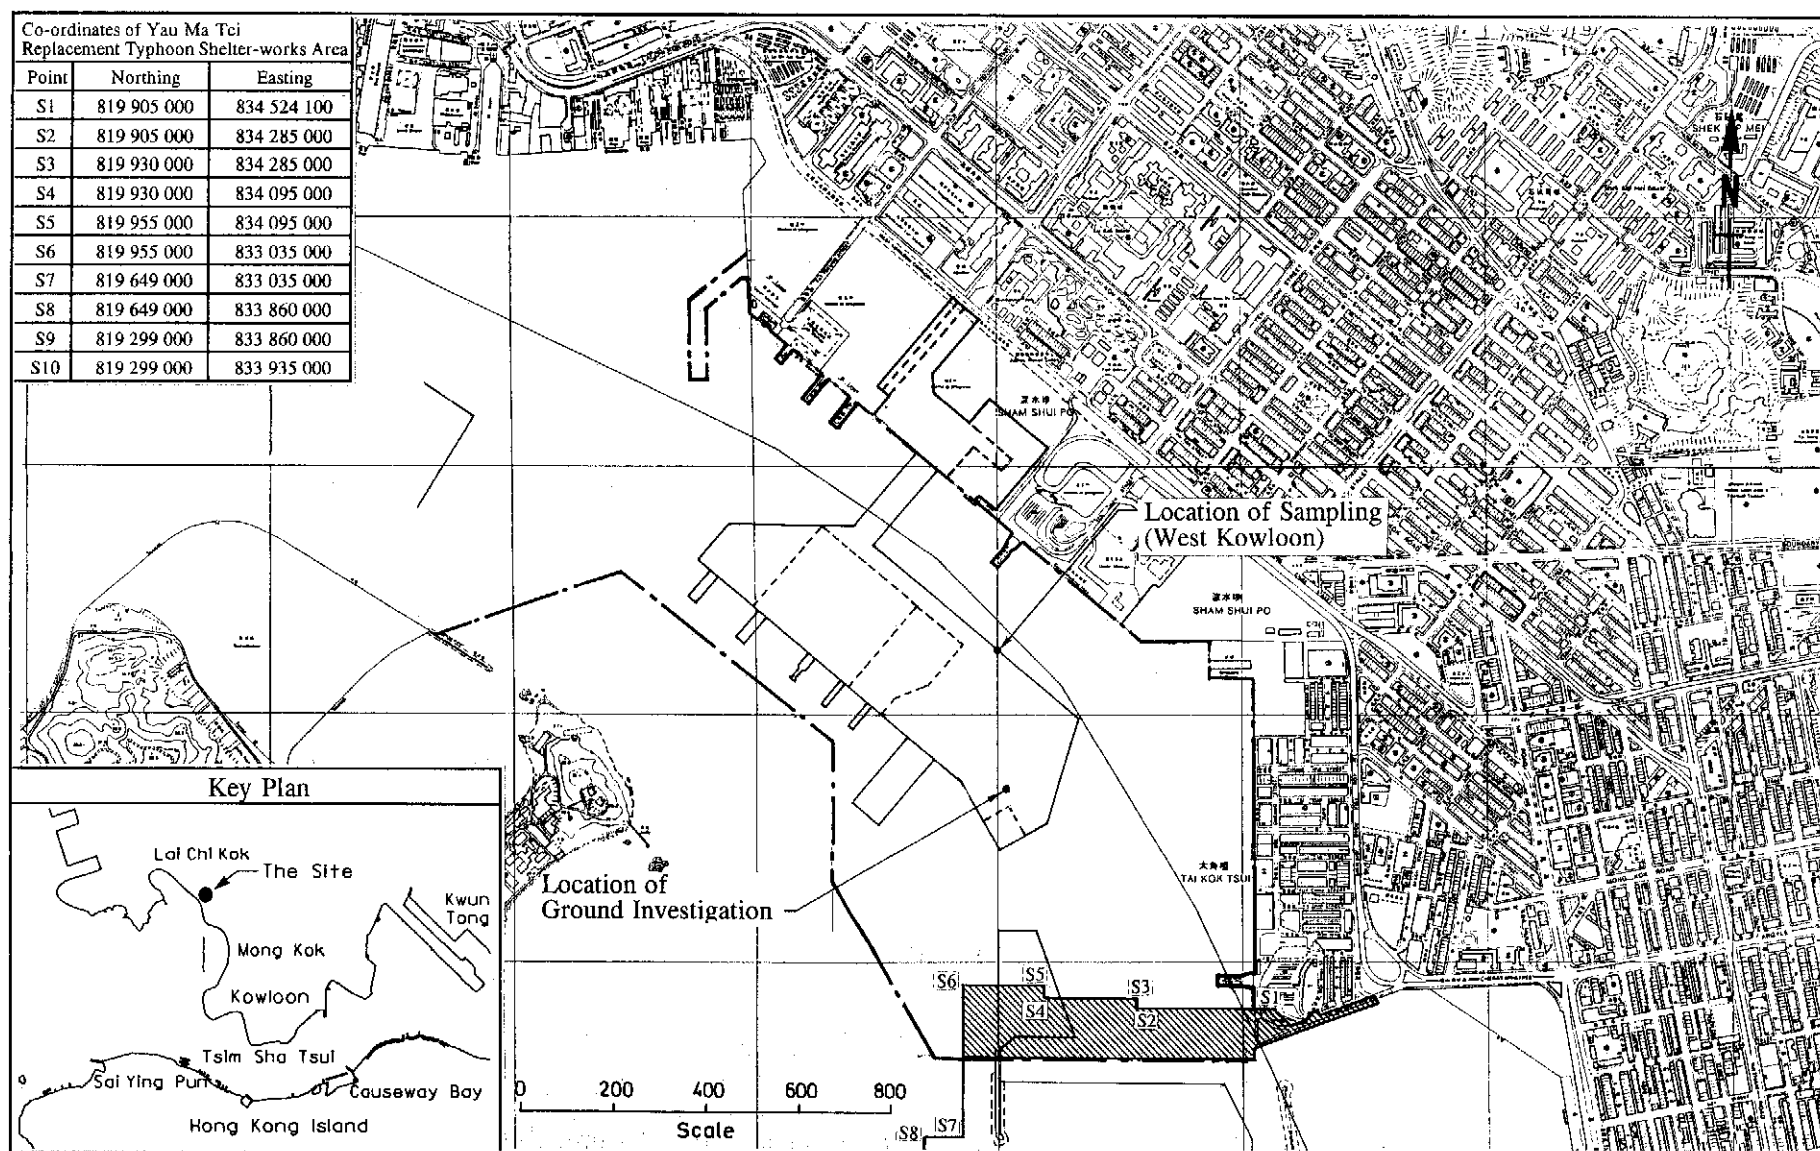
Site Location Plan (West Kowloon Reclamation, North Section)
